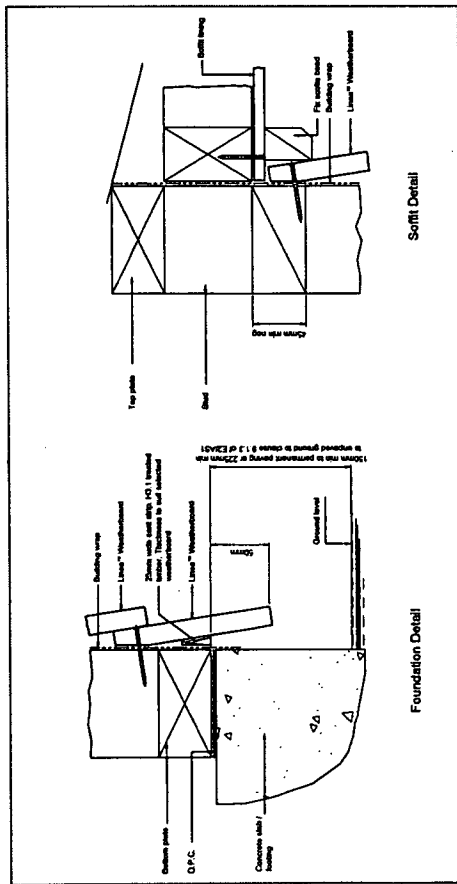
DIRECT FIX CONCRETE SLAB AND SOFFIT
